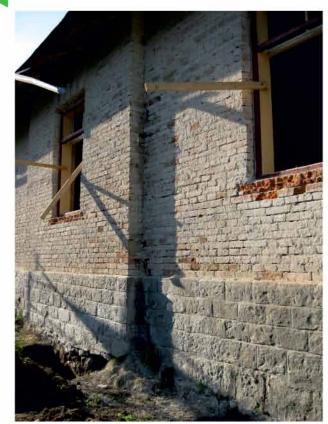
EXTERIOR WALL, BASE, FOUNDATION [detaliu perete exterior, soclu, fundatie]
